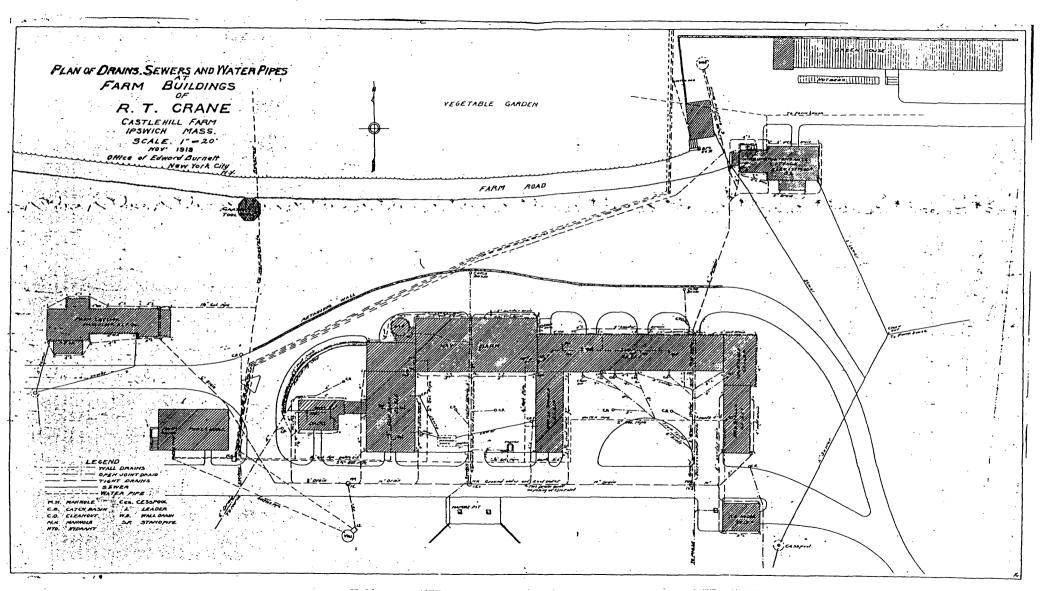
Plan of Drains, Sewers and Water Pipes at Farm Buildings of R. T. Crane Castle Hill Farm, Ipswich, Mass.; November, 1918. Office of Edward Burnett; New York City, N. Y.
